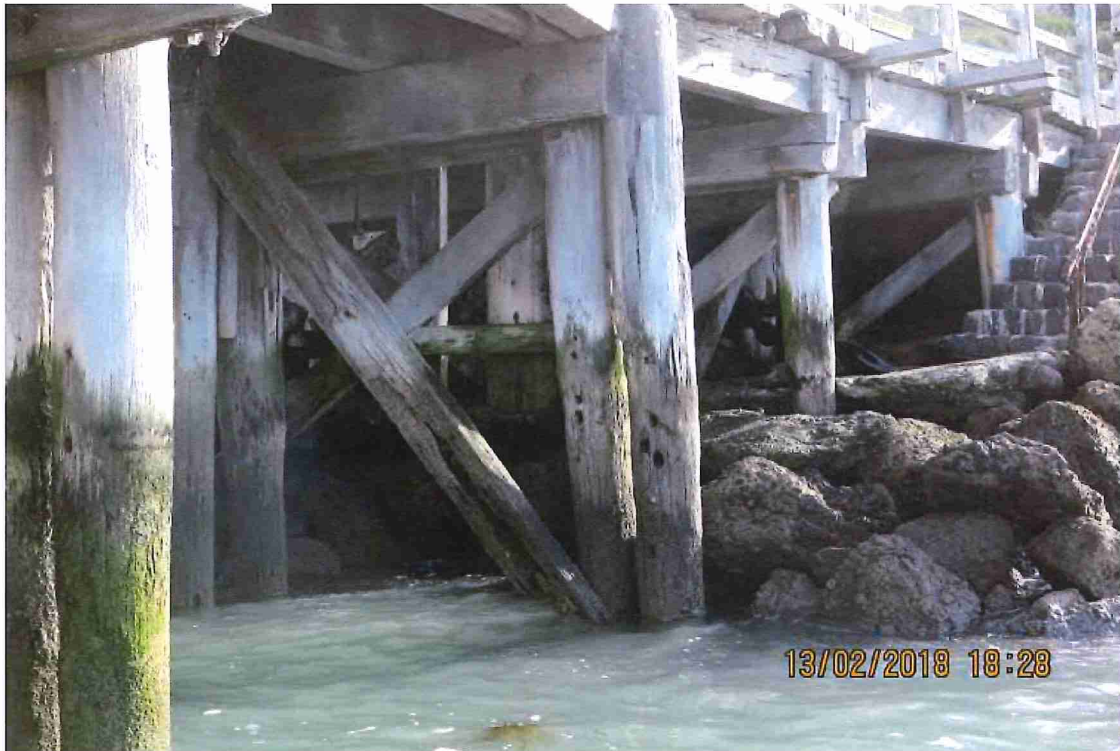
Heavily waisted load bearing pile second from left - pile bent 3
